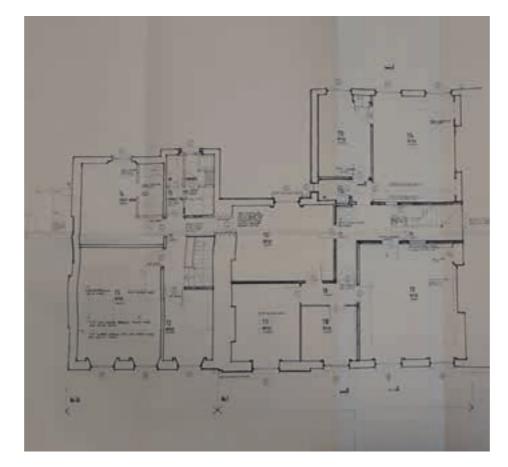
Third floor plan of the properties in 1984 showing proposed internal alterations
